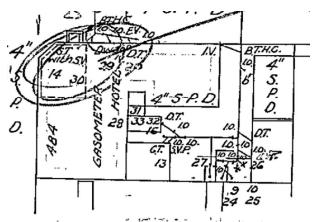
A plan of the site showing footprints of the buildings extant in 1956, annotated with sewerage works (PSP).
